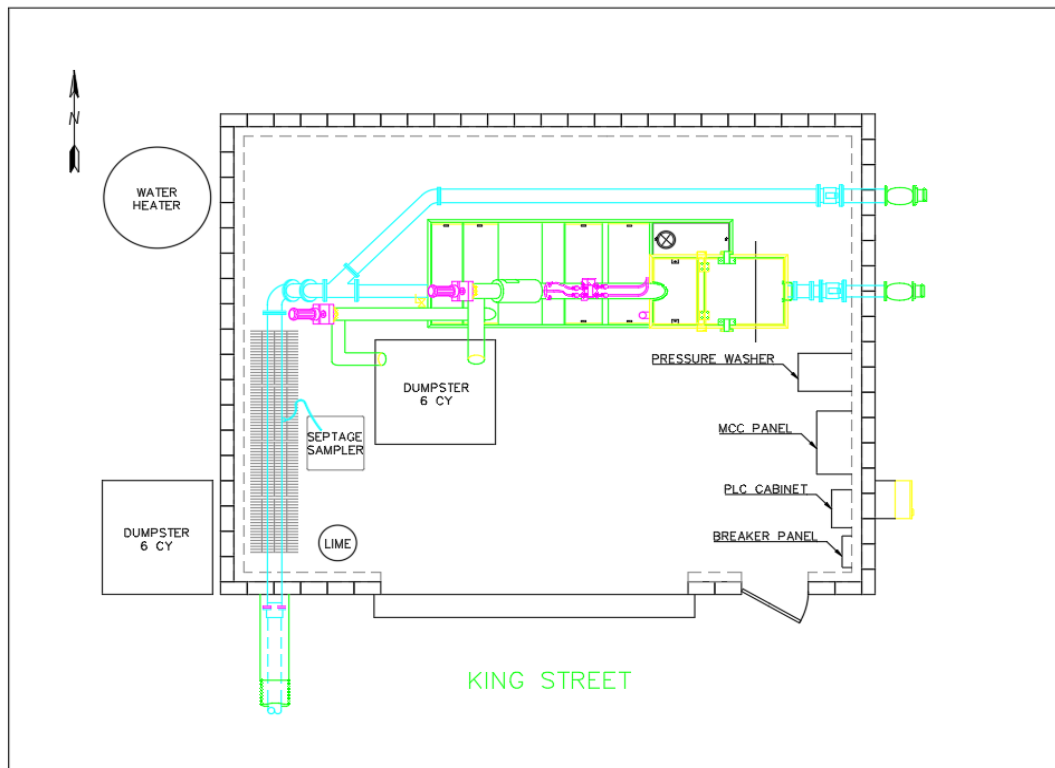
Proposed Floor Plan of King Street Septage Receiving Station Upgrade
